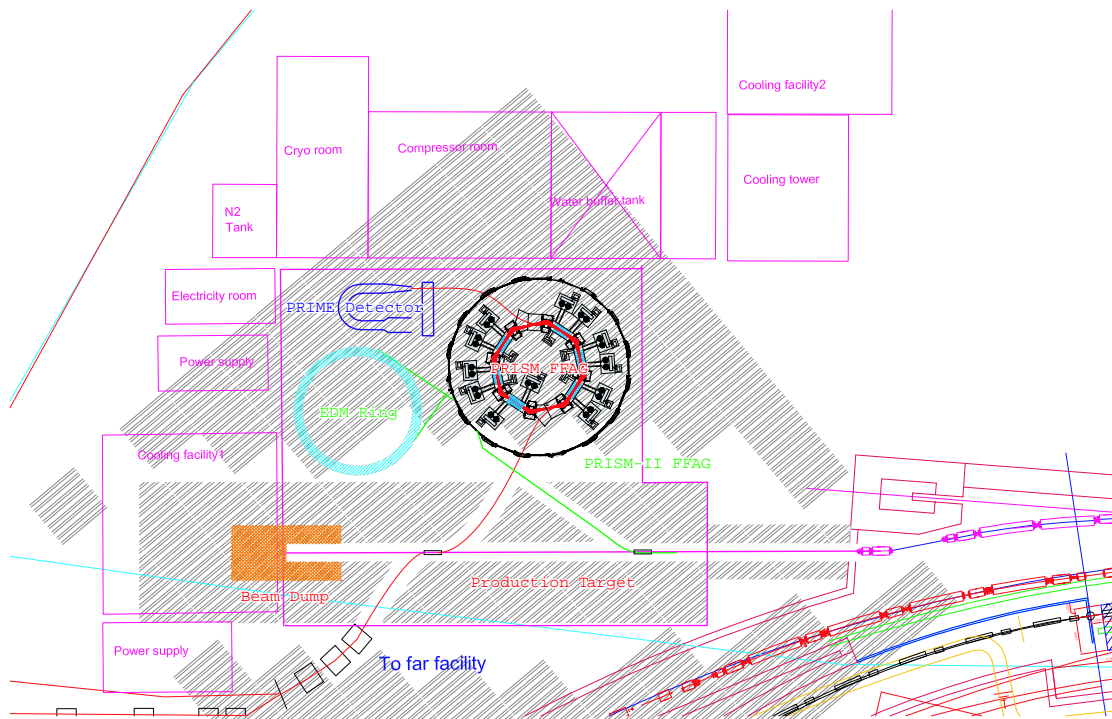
A possible layout of the near facility where PRISM and PRISM-II are installed.
